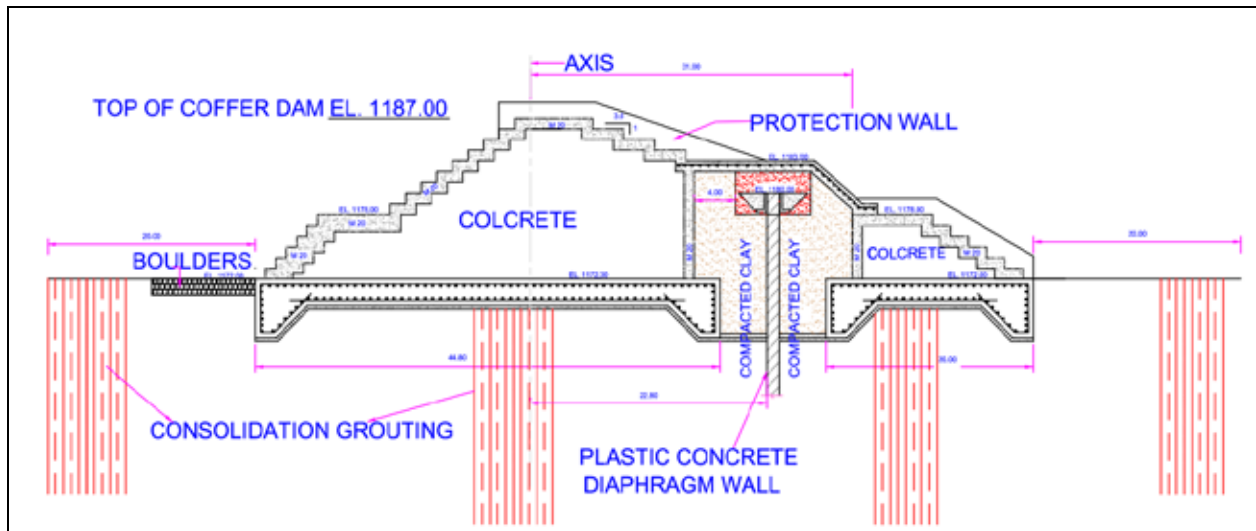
Section of Upstream Cofferdam at abutments (colcrete type) with clay and plastic cut off wall
